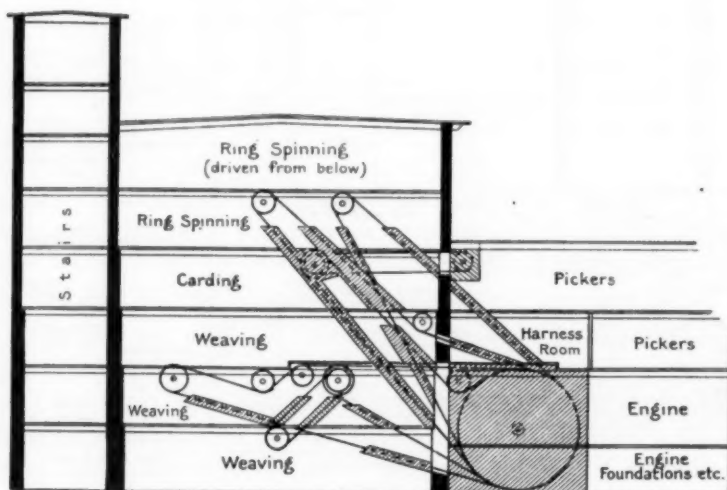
SECTION SHOWING BELTS AND WOODEN BOXING BEFORE FIRE OF SEPTEMBER 15, 1907
